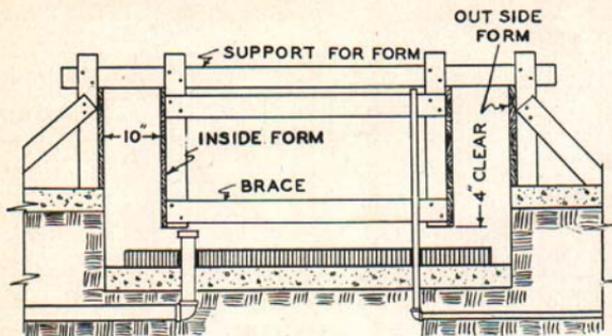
Step No. 3. The outside forms have been placed for the wall of the tank and the inside forms are supported on the outside forms. Bottom of inside forms should be 4 inches above floor insulation.
